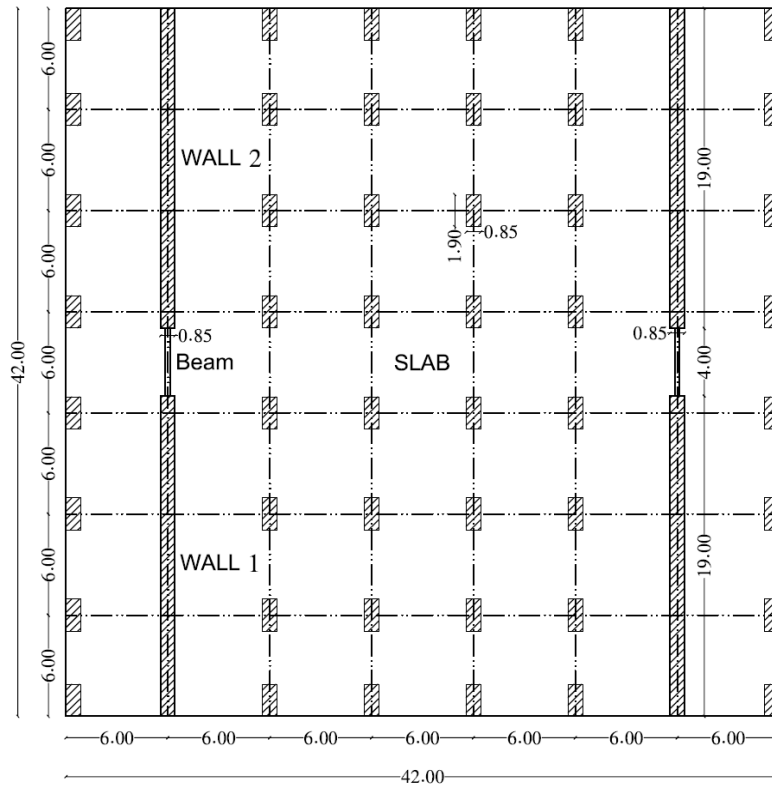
Typical structural plan of buildings in group (1) without frame.
